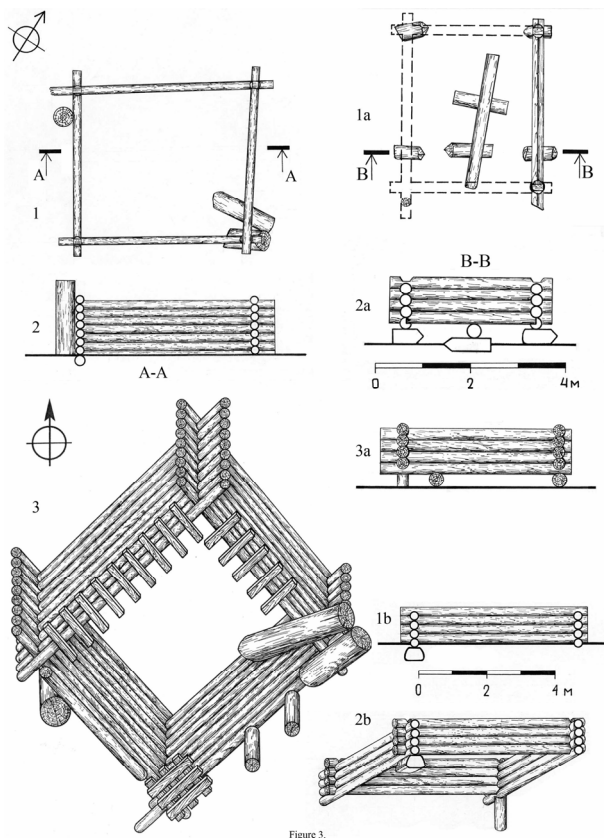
Underpinnings of log walls and floors – logs, foot blocks, piers.
